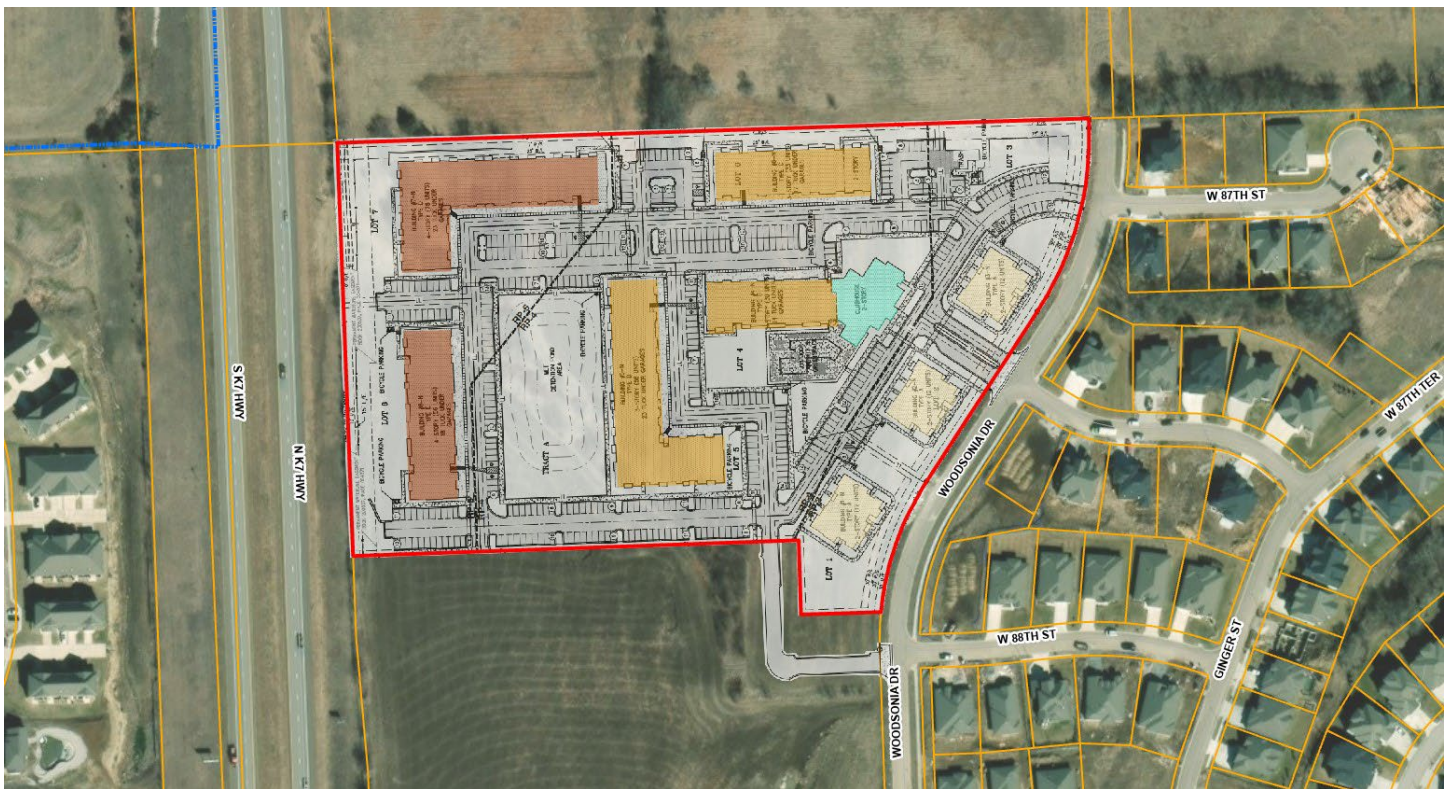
Reserve at Copper Creek phase 1 site plan.
